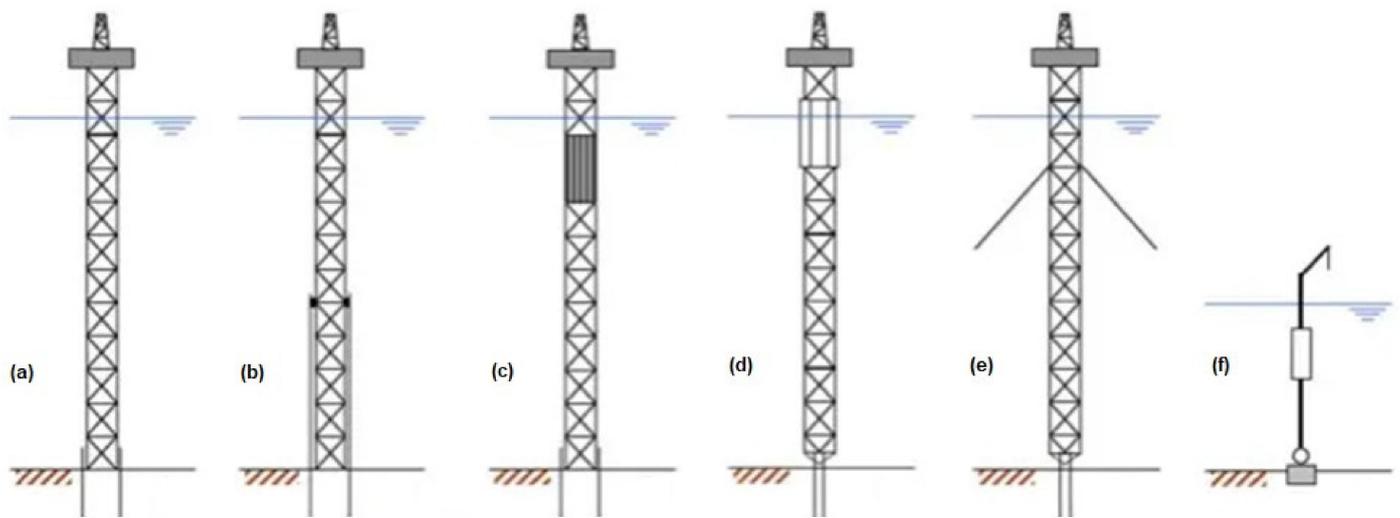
Cross-section of different concepts of compliant towers used in the oil and gas industry, showing (a) “dumb” tower, (b) compliant piled tower, (c) compliant tower with ‘mass trap’, (d) buoyant tower with flex joint, (e) guyed tower with flex joint, and (f) articulated column.
